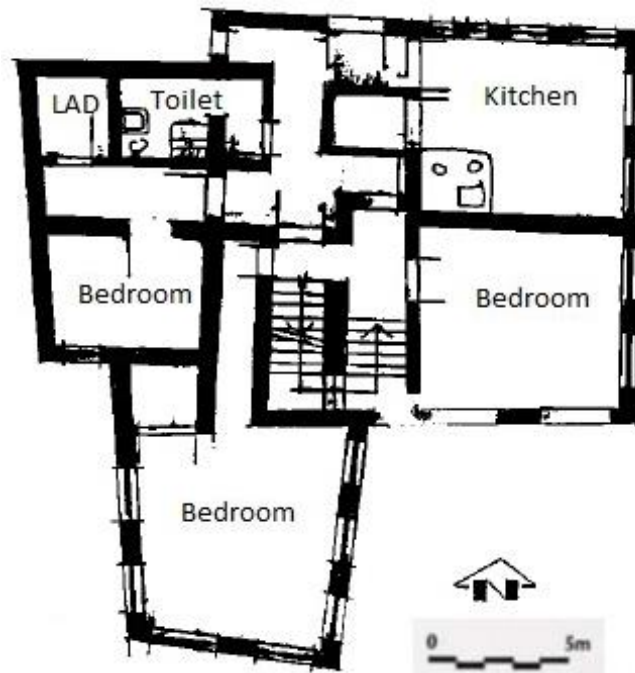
Sheikh Abu Bakr (Fourth Floor) House (Al-Maashi, 1998)
